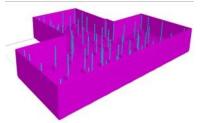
STADD pro 3D modeled view of raft foundation and retaining wall.
